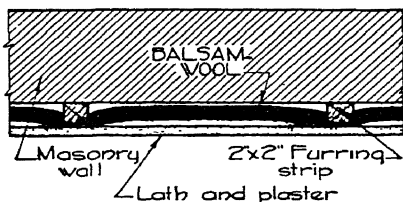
Section of Masonry Wall Showing Blanket Insulation
